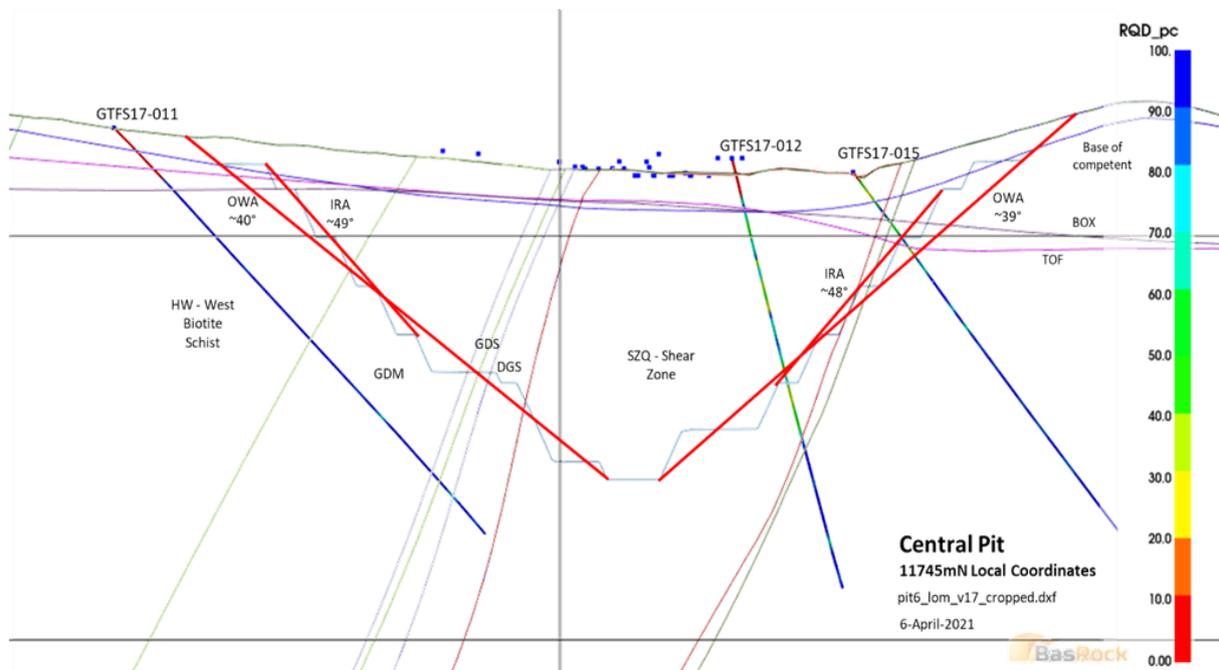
Section 11745.5mN showing batter/berm configuration of the Central Pit.
